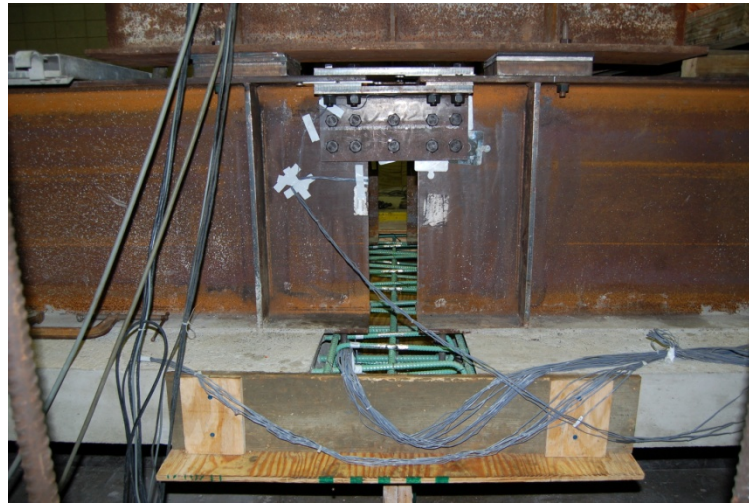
Full scale lab test specimen prior to placing UHPC concrete
